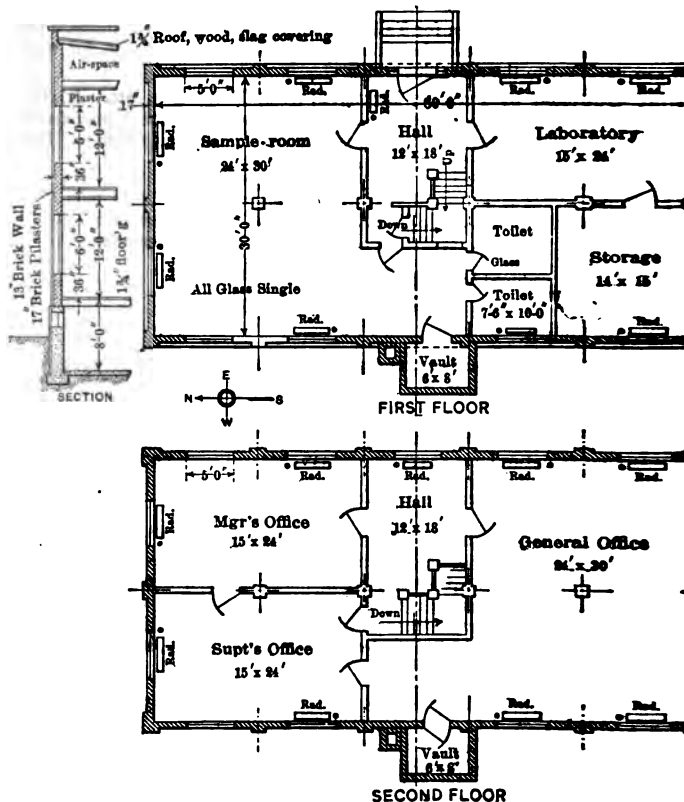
Floor-plans and Section of Building Explained in Table VII. (See, also, Fig. 4)
